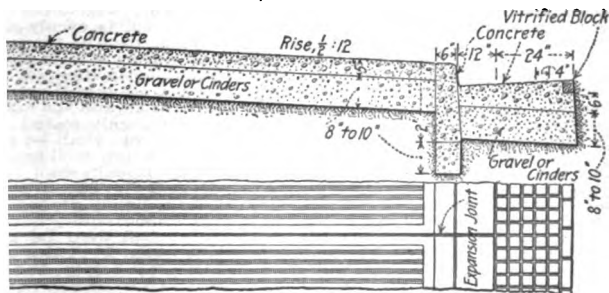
Concrete Curb, Gutter and Sidewalk.
